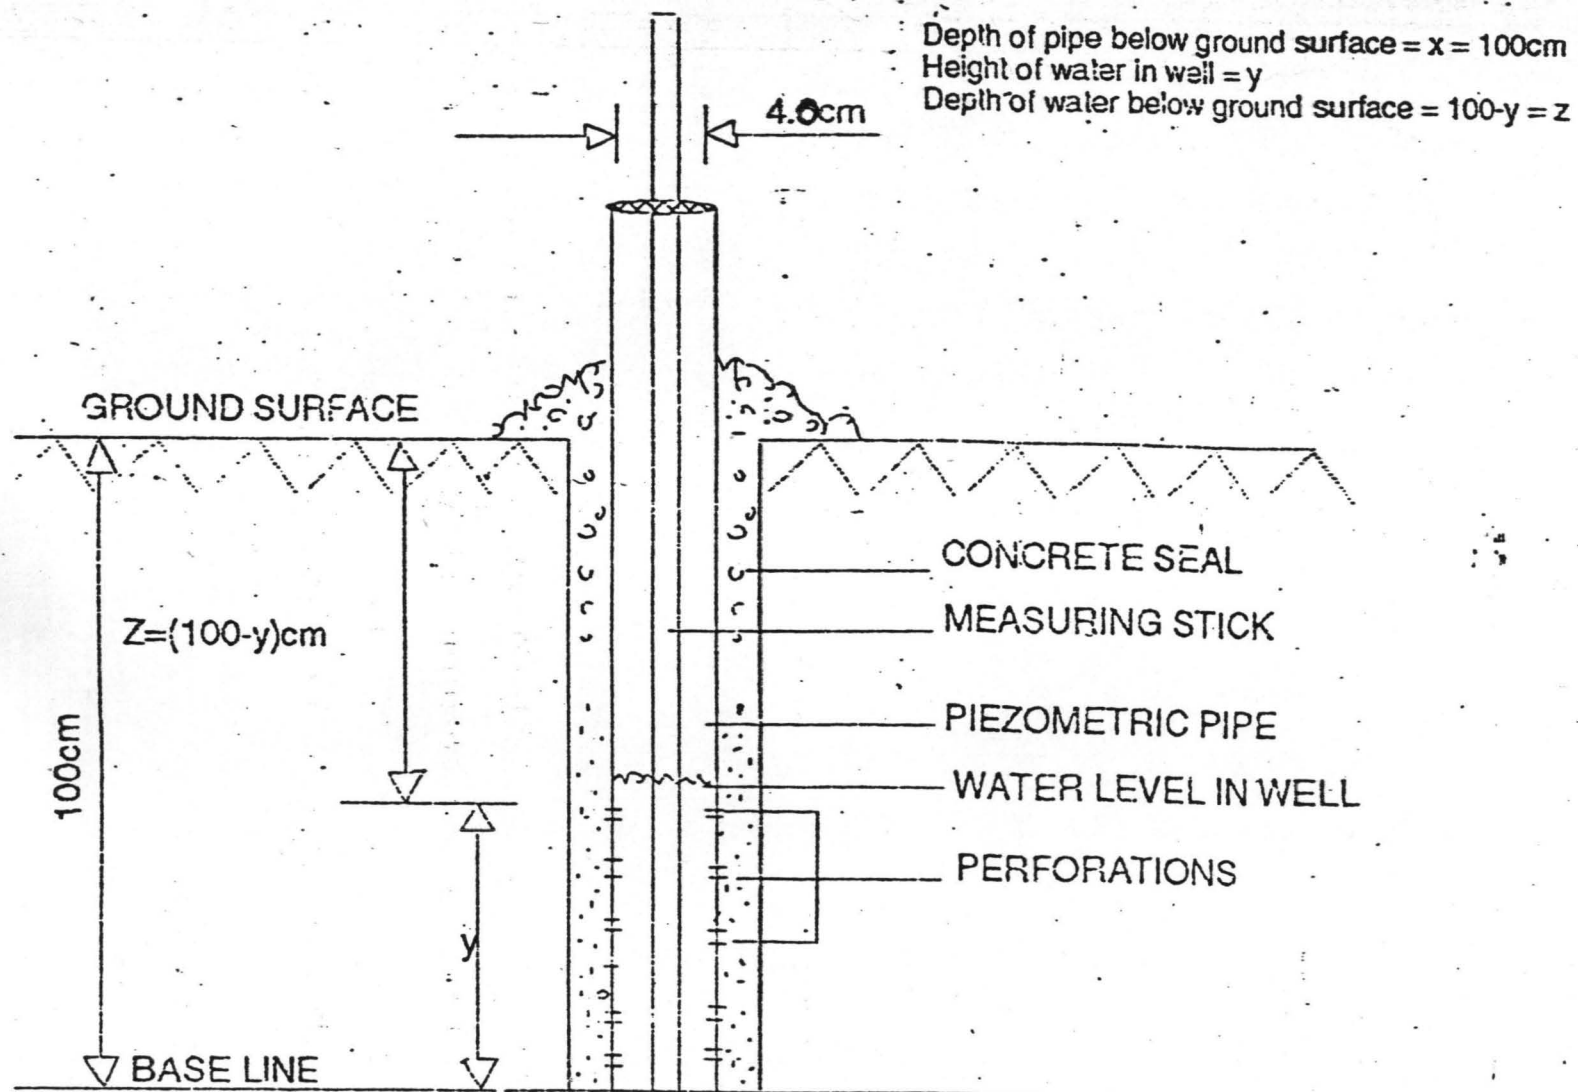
CROSS-SECTION OF PIEZOMETER INSTALLATION (Source, IDris 1997)
